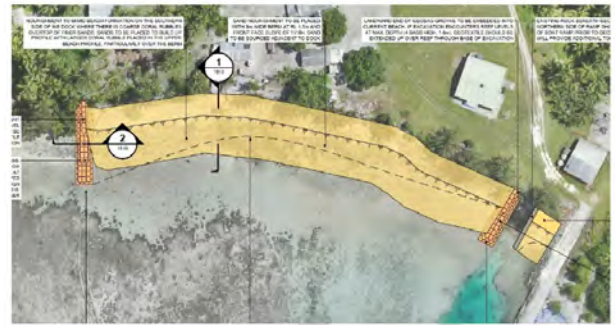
Ine Village plan alignment and geobag groyne section.
